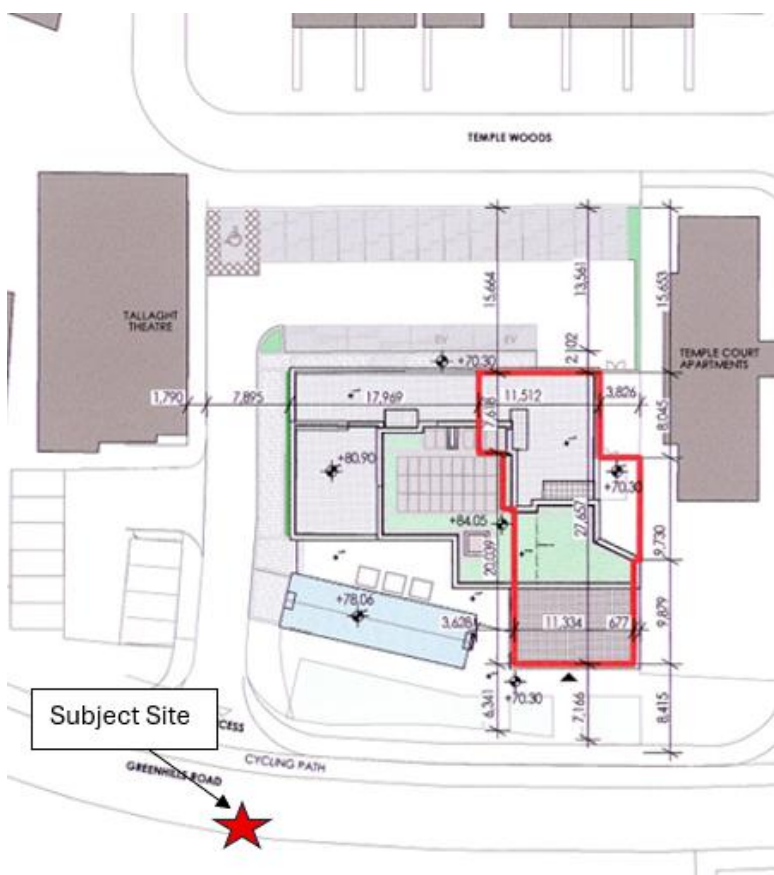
SD25A/0192 Site Layout Plan (Source: SDCC)
